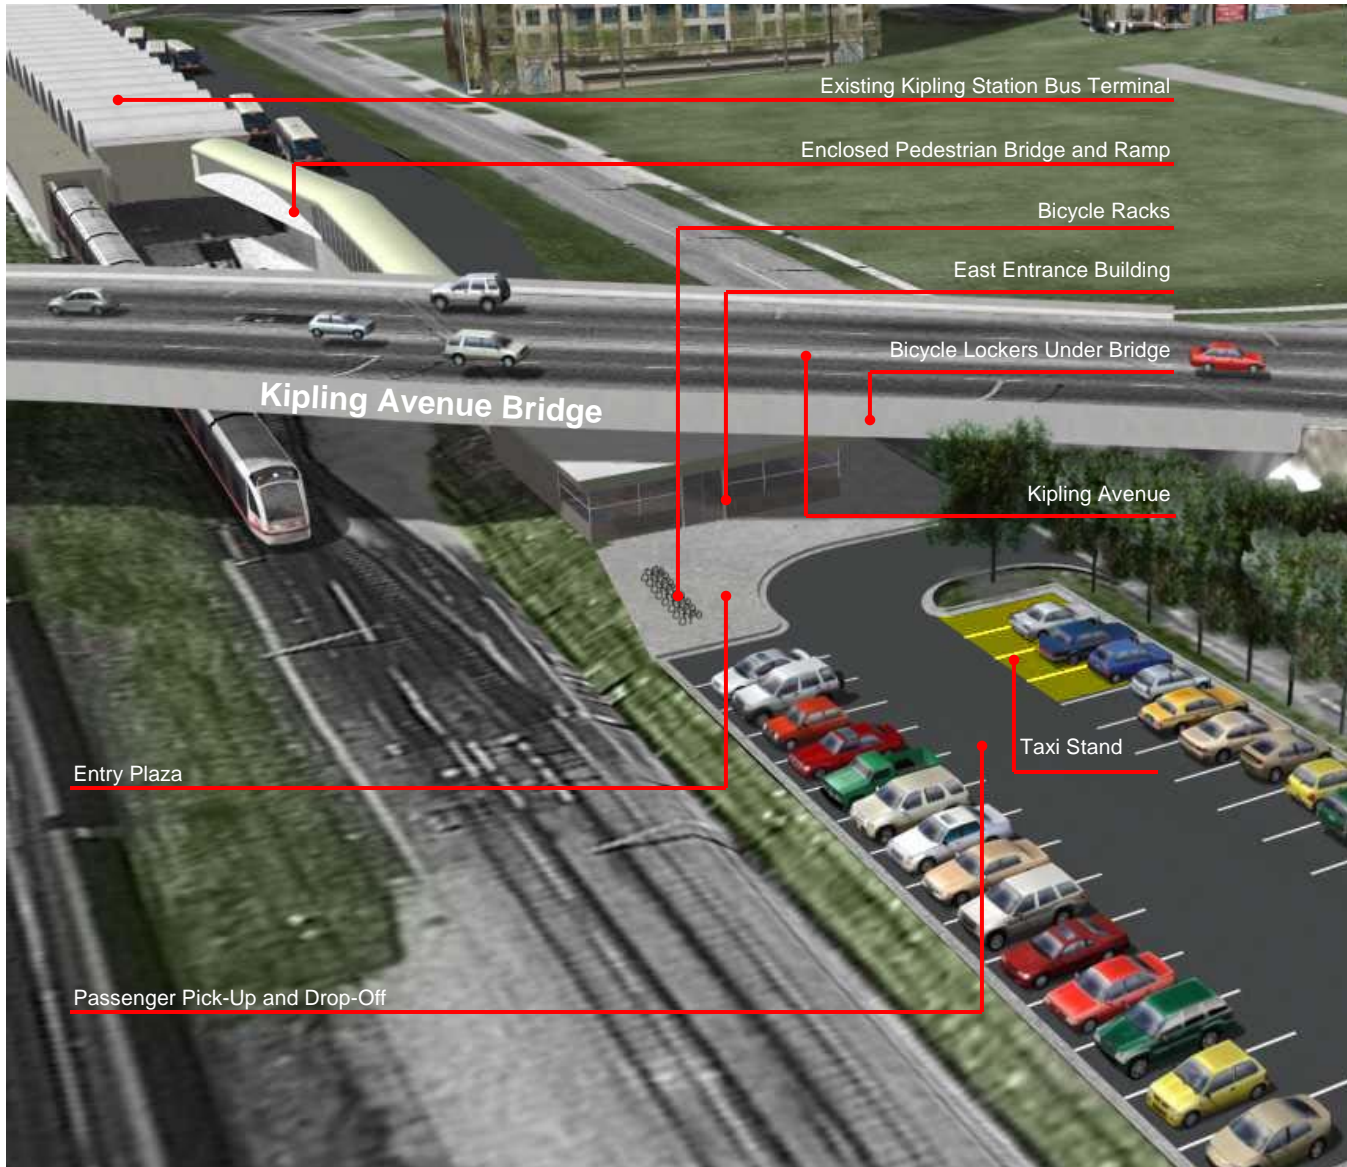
East Entrance & Passenger Pick-up and Drop-off
